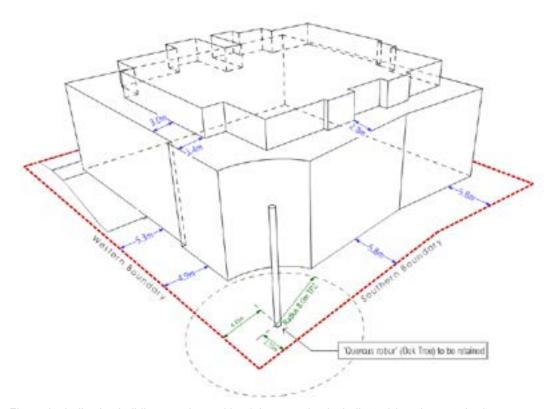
Indicative building envelope with minimum setbacks indicated (south-west view)
